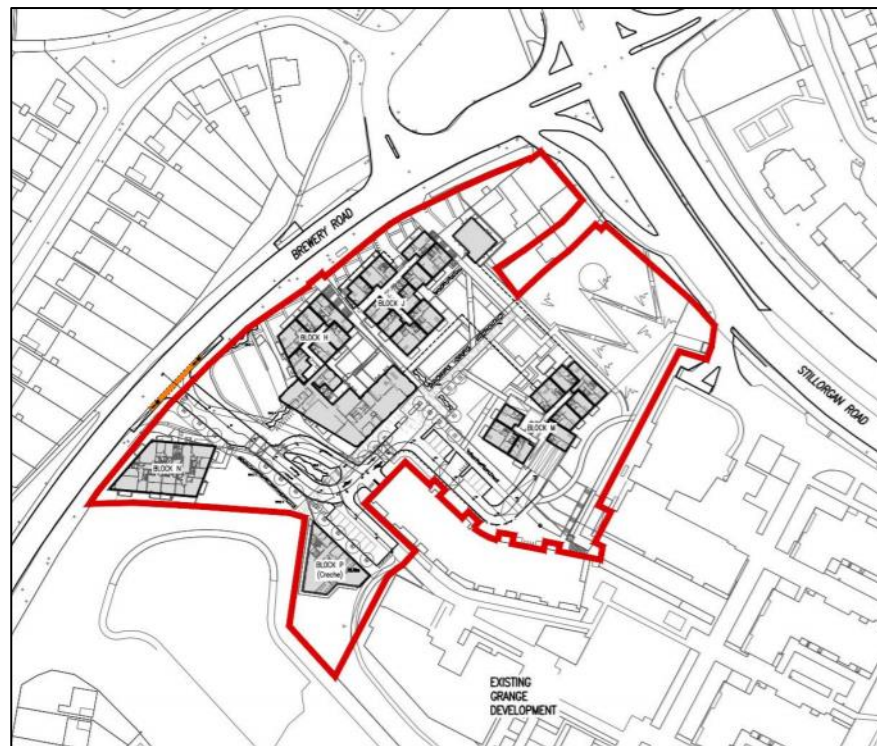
Proposed Site Layout Plan - Brewery Road/Stillorgan Road © Dun Laoghaire-Rathdown County Council 2020
